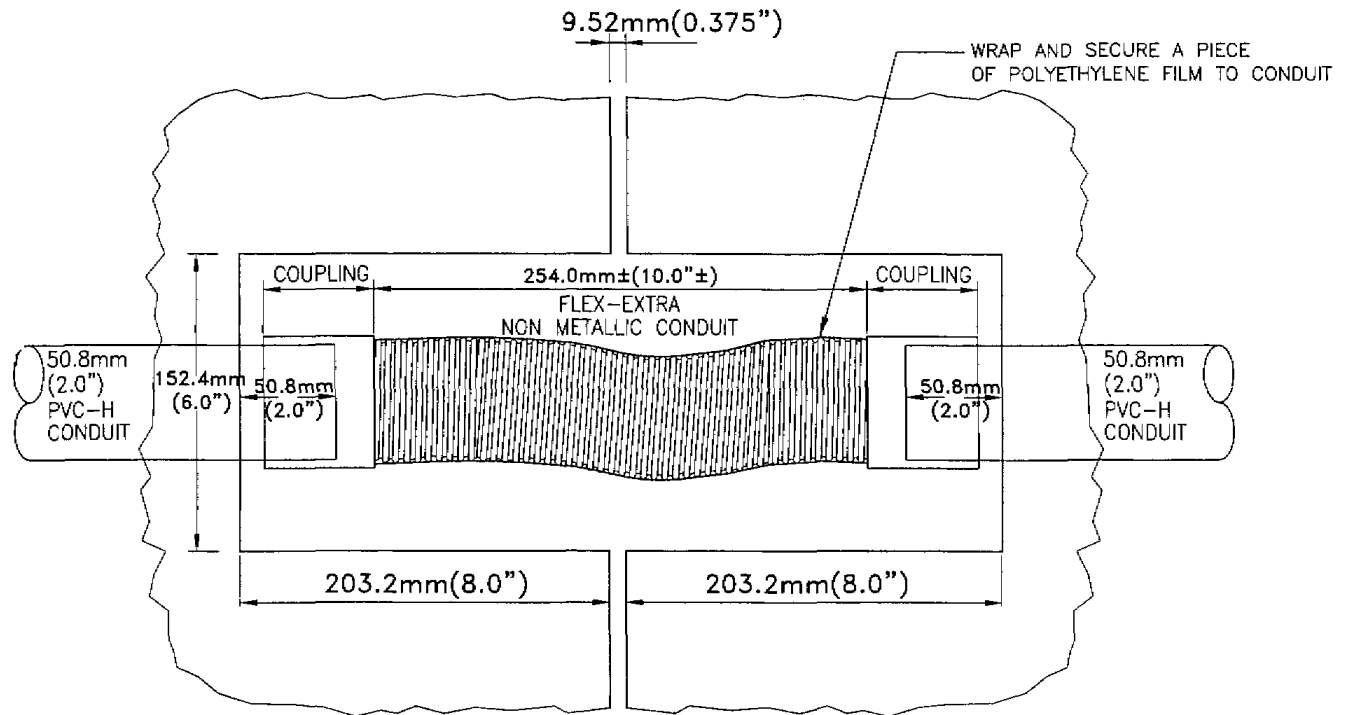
La Guardia Taxiway Light Electrical Connection Detail and Construction
